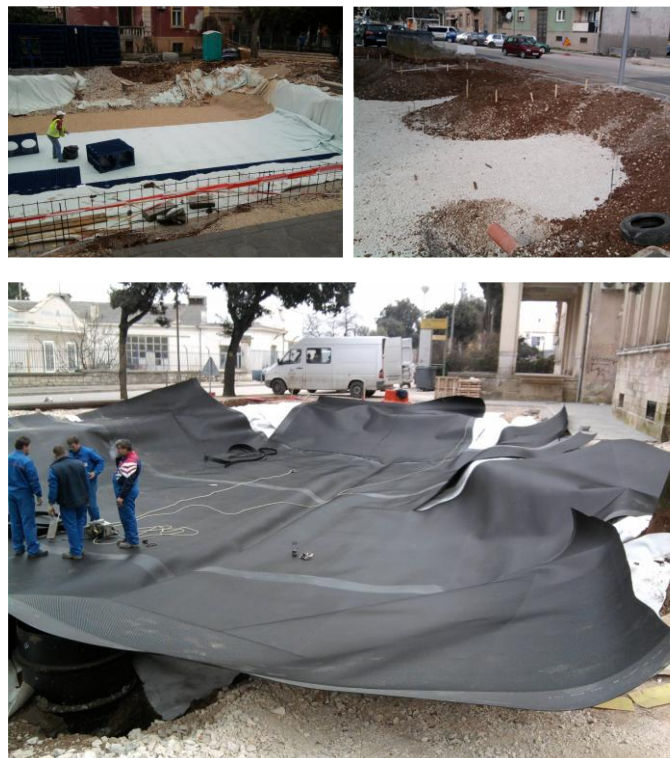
Construction of rain garden retentions of Nazorova Street [6]
